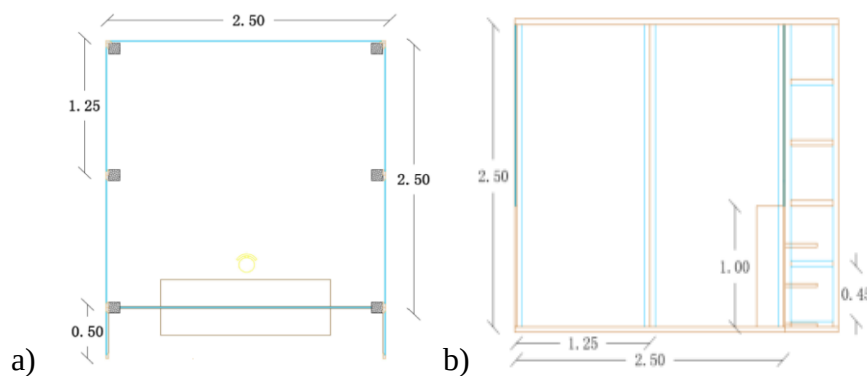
, b: a) plan of kiosk b) side view of kiosk
